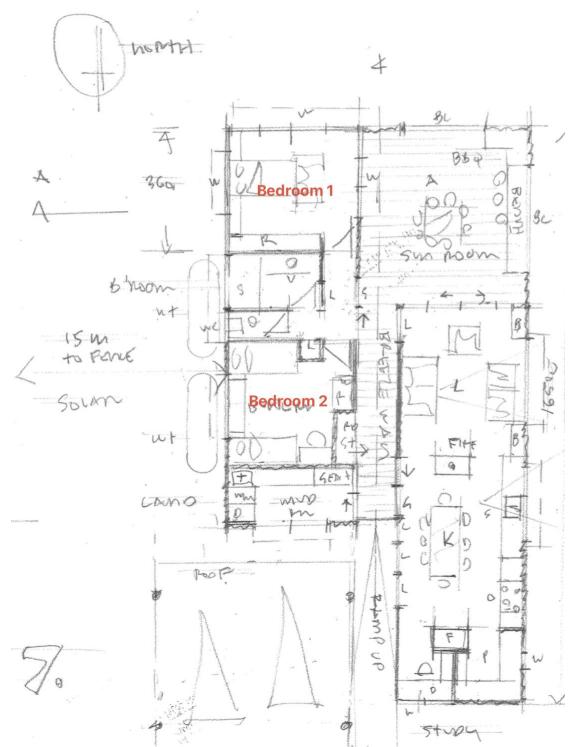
Floor plan of proposed dwelling (source: RSA Architects SK-07)
